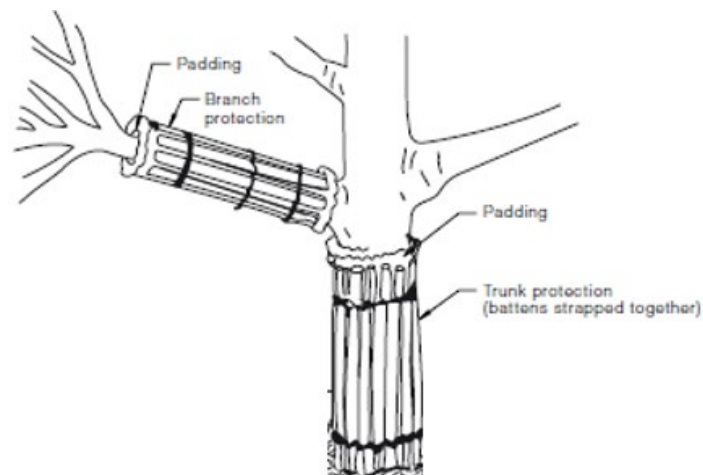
Example of trunk and branch protection (Source: AS 4970-2009).
